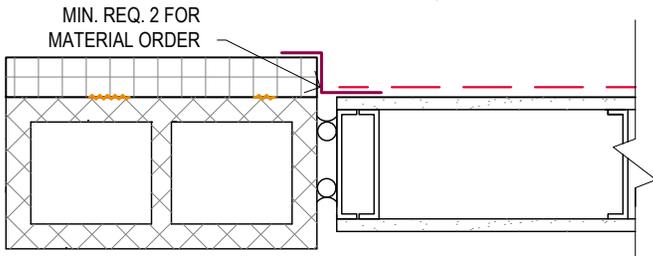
TRANSITION FROM ULTRA TO WRB ON EXT. GYP. | PLAN
